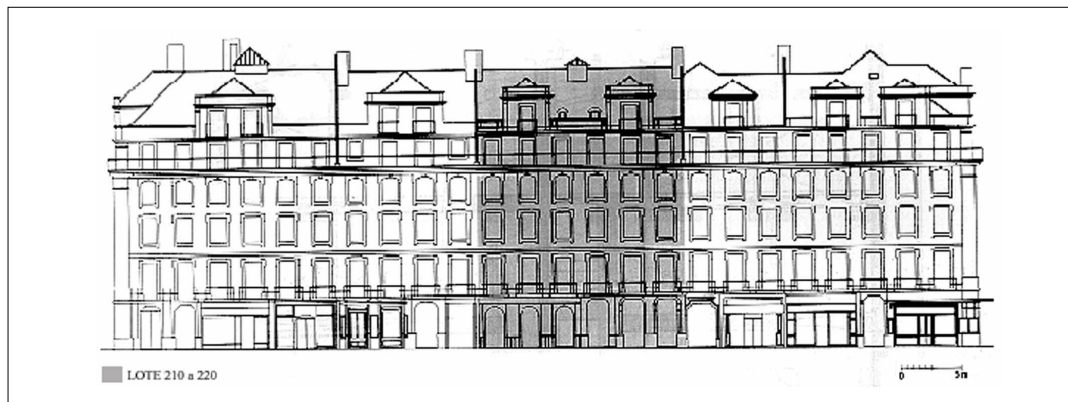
Façades architecture of a Downtown typical block (Santos [3])
